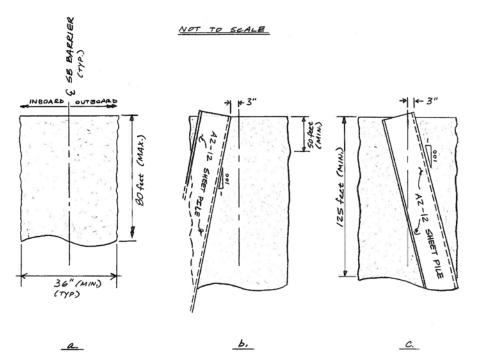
Assessment of Verticality of Sheet Pile Wall: (a) Existing SB Barrier; (b) Sheet Pile Installed at Inboard Limits; (c) Sheet Pile Installed at Outboard Limits
